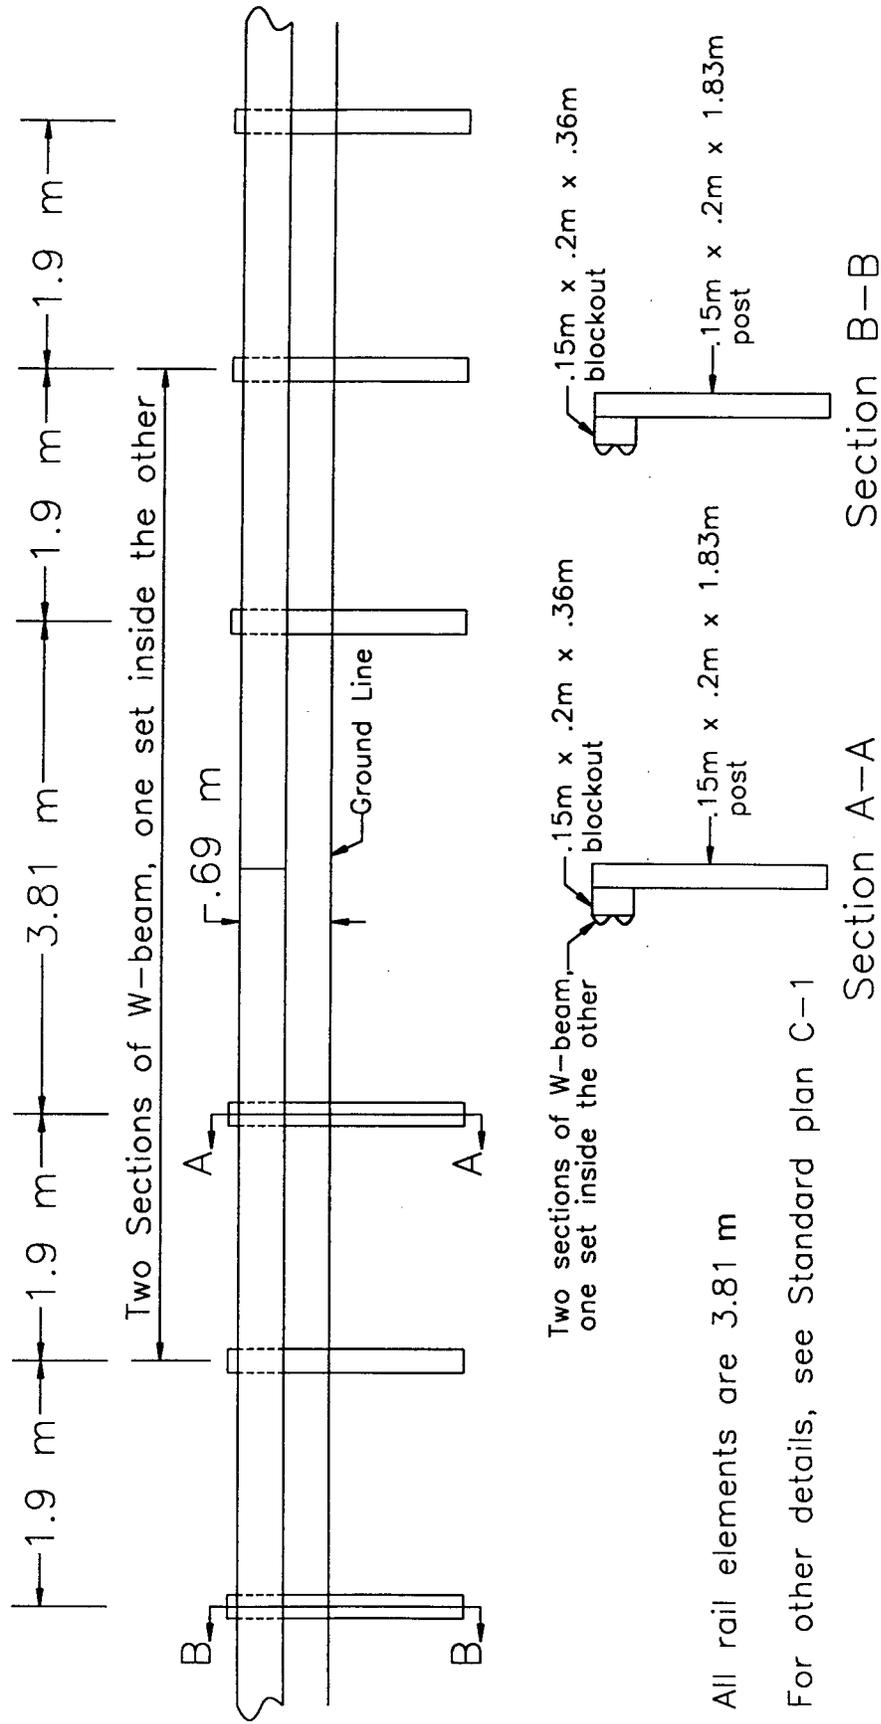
Details of long-span nested W-beam guardrail over low-fill culvert.
